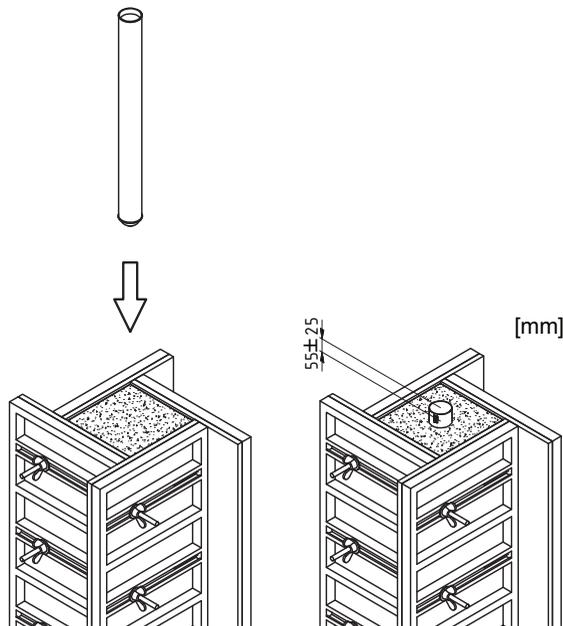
Placing the Cast-in Sleeve body into the concrete column.
